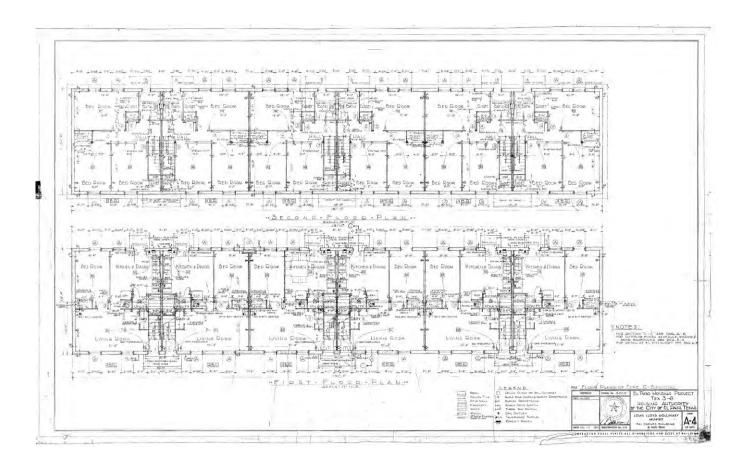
Ray Sherman Place – Original Floor Plans of Type C Buildings by Louis Lloyd Mollinary Architect, dated November 1951.
